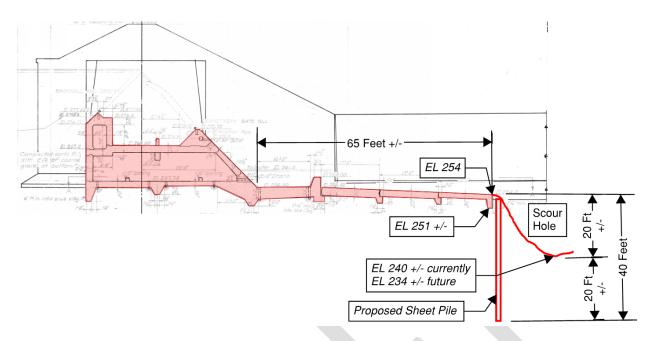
Proposed Sheet Pile at H-5 Scour Hole Downstream of Spillway Apron
